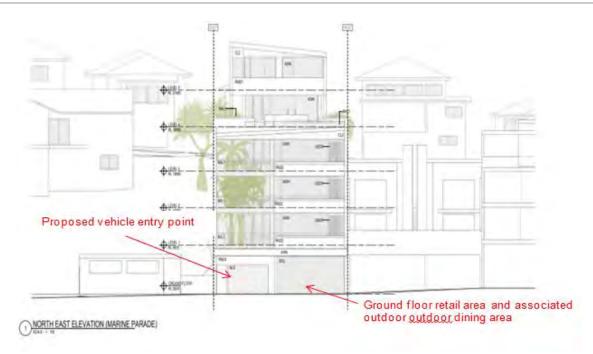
Extract of North East Elevation Plan (Marine Parade streetscape) submitted with the DA
